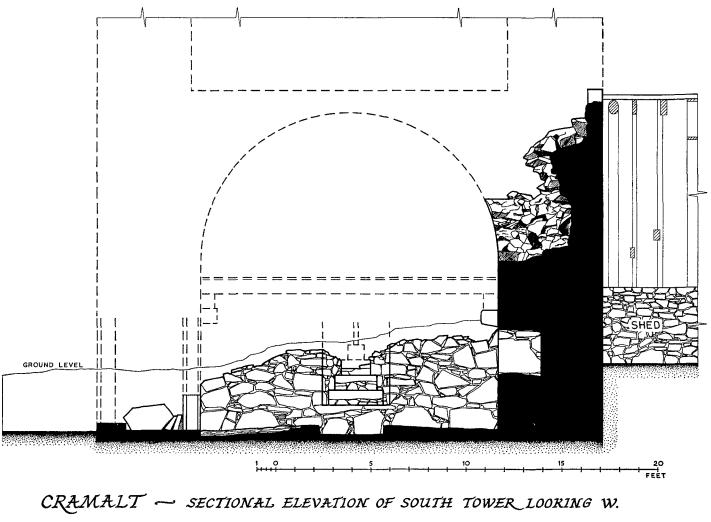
Cramalt: Sectional elevation of South Tower looking West
